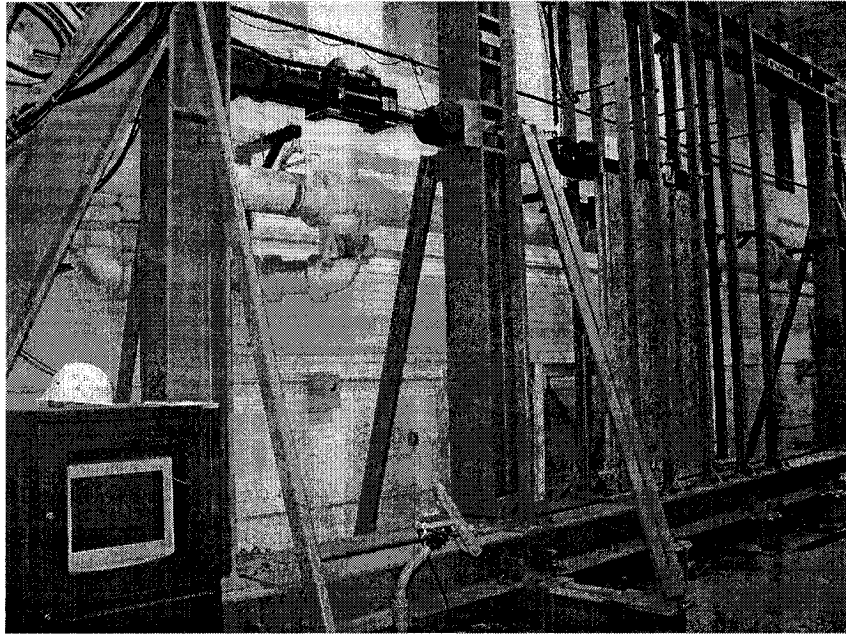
Shear wall test frame in structures laboratory at McGill University
